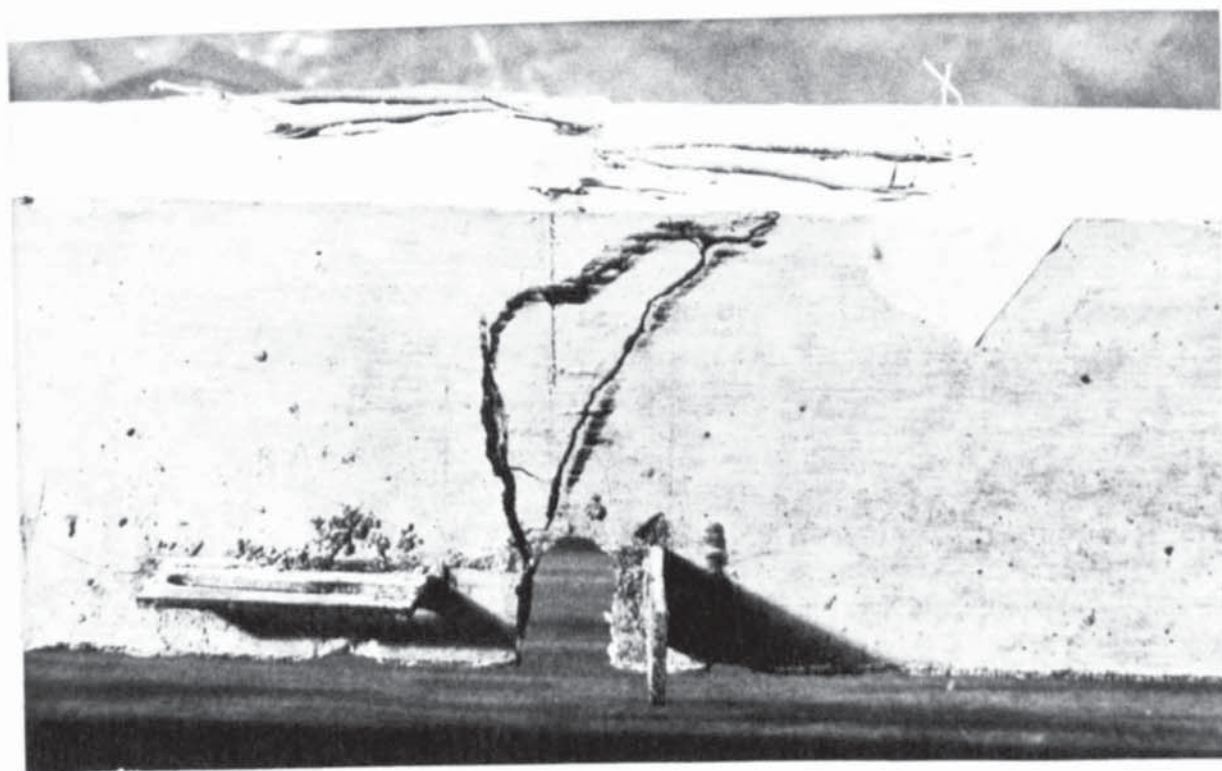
TENSILE CRACK ALONG DEPTH OF CONCRETE STRIP
